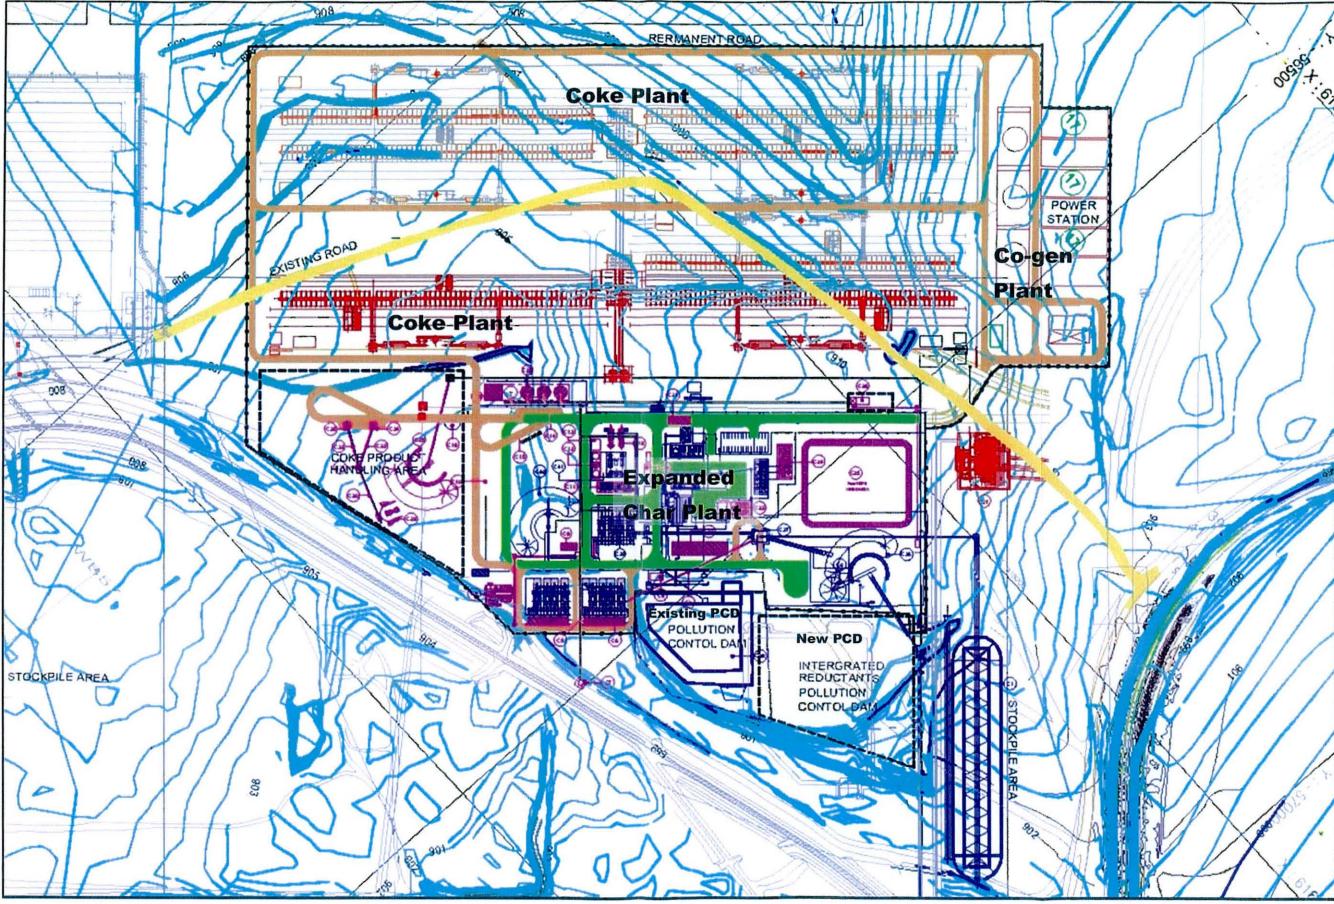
Site Layout of Char Manufacturing Plant Expansion, Coke and Co-gen Plants (undergoing a separate EIA)
